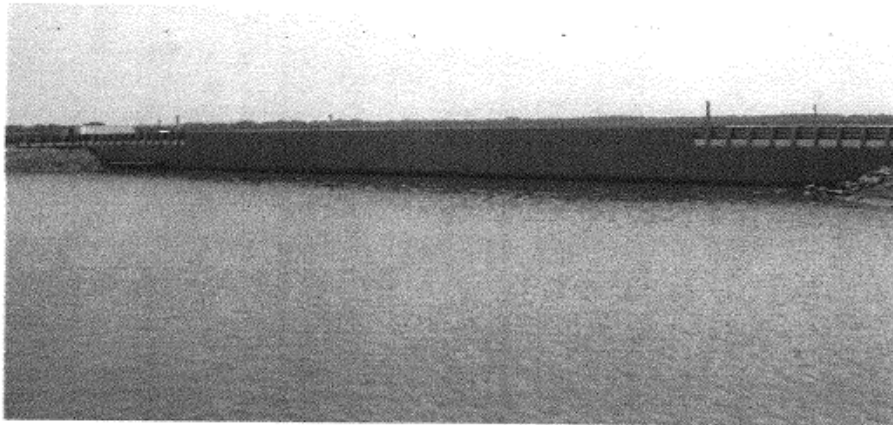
CS-29 Black Bayou Culverts - West Side/Outlet
